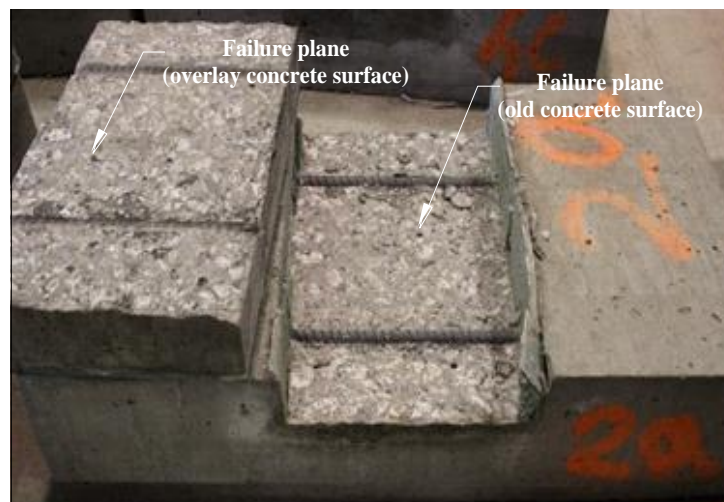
Case 1 pull-off test specimen failure in concrete overlay
